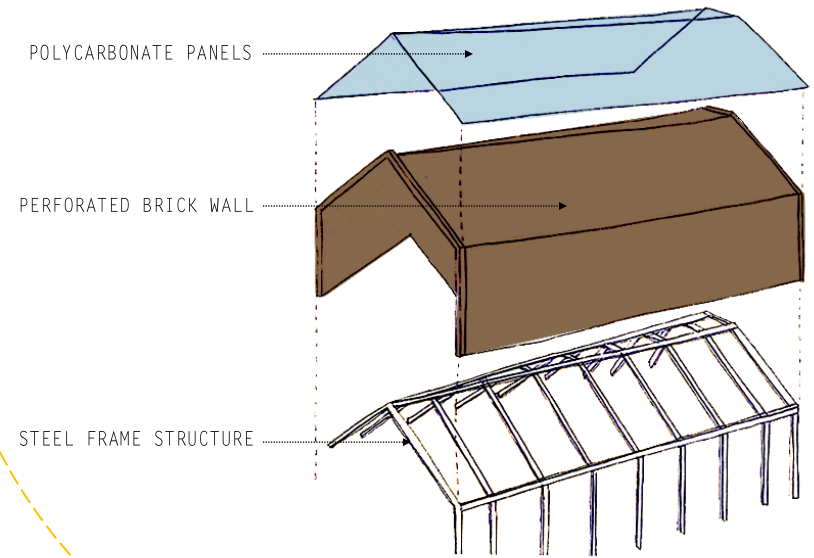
(left): Detail sketch of brick skin construction, by Author, 2019.
